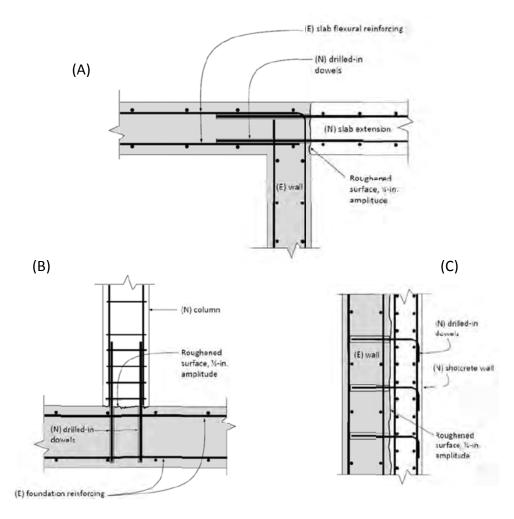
APPLICATION EXAMPLES FOR POST-INSTALLED REINFORCING BARS:
